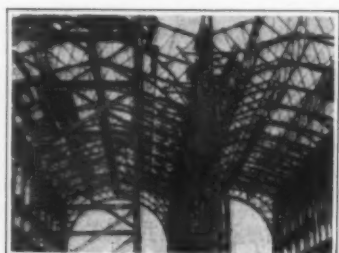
A section of the arched trusses forming the framework of the roof.
